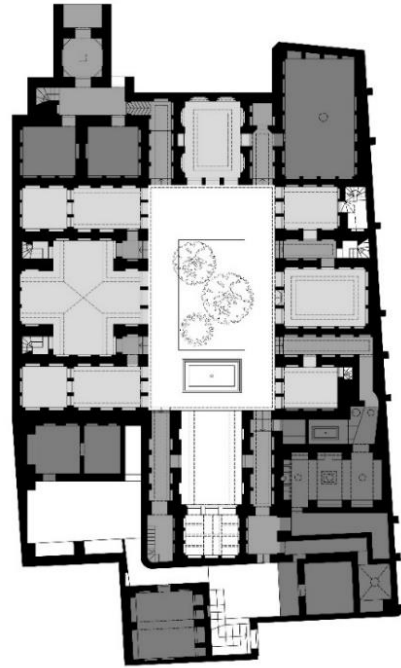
, Tehrani house, ground floor plan, drawing by author, base map from (Haji-Qassemi, Harirchi and Qelichkhani 2005)
